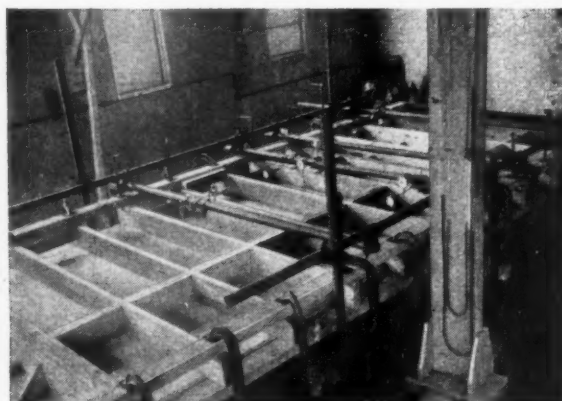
Rig for static loading tests. (Floor section is inverted, with captive airbag beneath for loading.)
